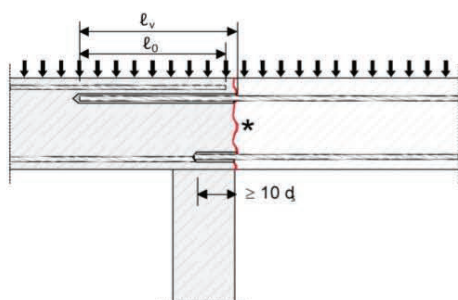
End anchoring of slabs or beams, designed as simply supported.
